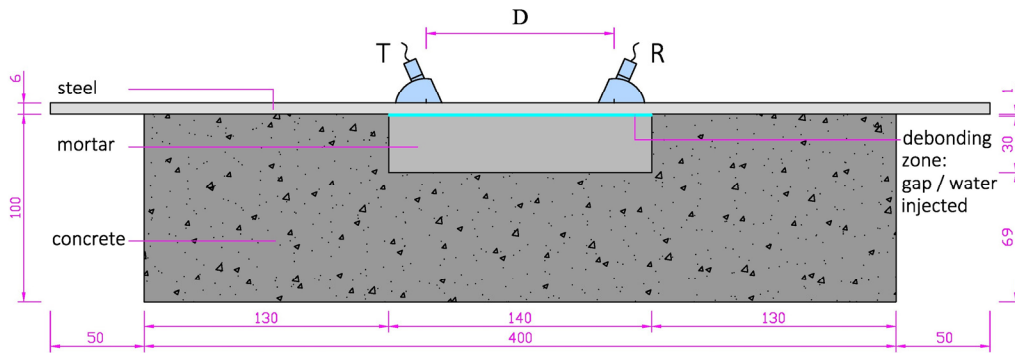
The 1st type casted specimen: steel-mortar-concrete layered media. (Dimension: mm)
